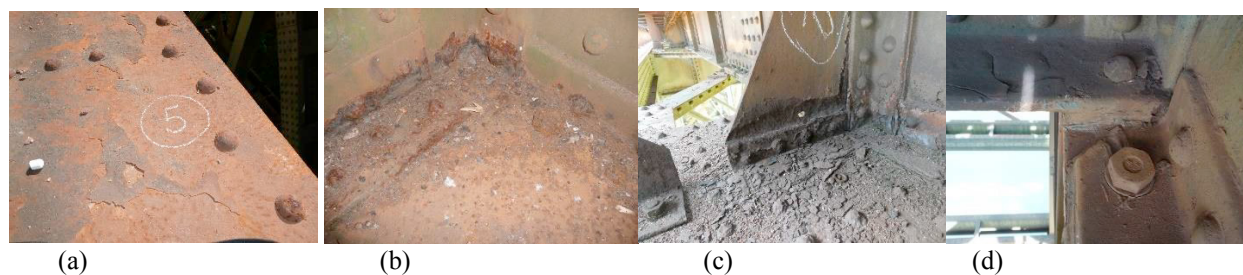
(a) horizontal surface corrosion, (b) exposed areas with corrosion, (c) joints stringer to transversal weakened by the corrosion (d) loosened rivet
